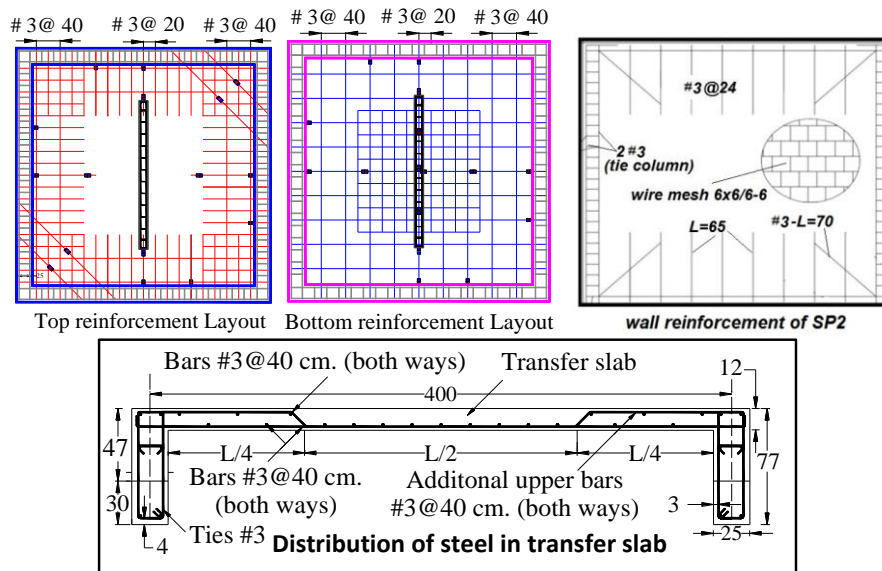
Reinforcement details in transfer slab and wall SP2; assembly of strain-gages in bars are included.
